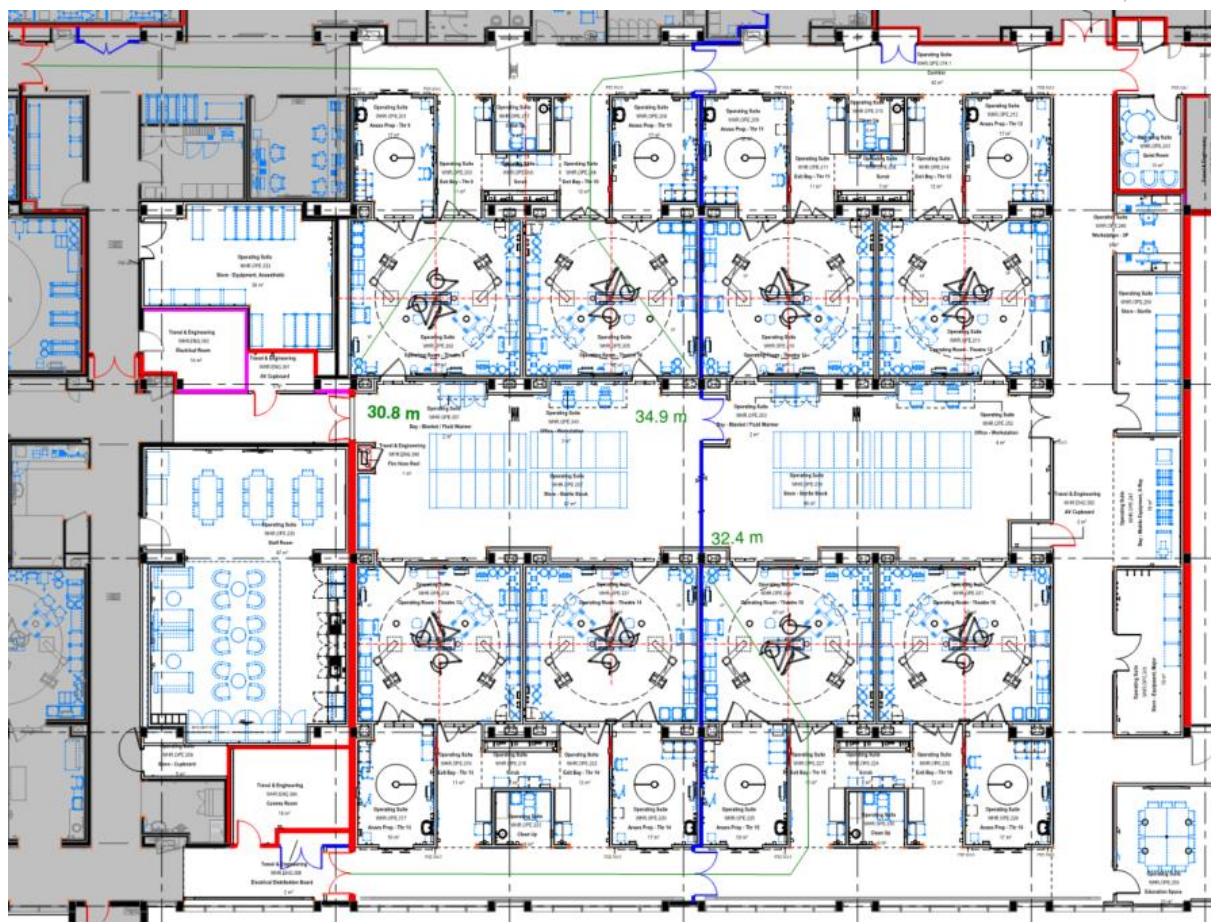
Locations of extended travel distance to a point of choice within the Level 3 OTs and Roof Top Plant Room
